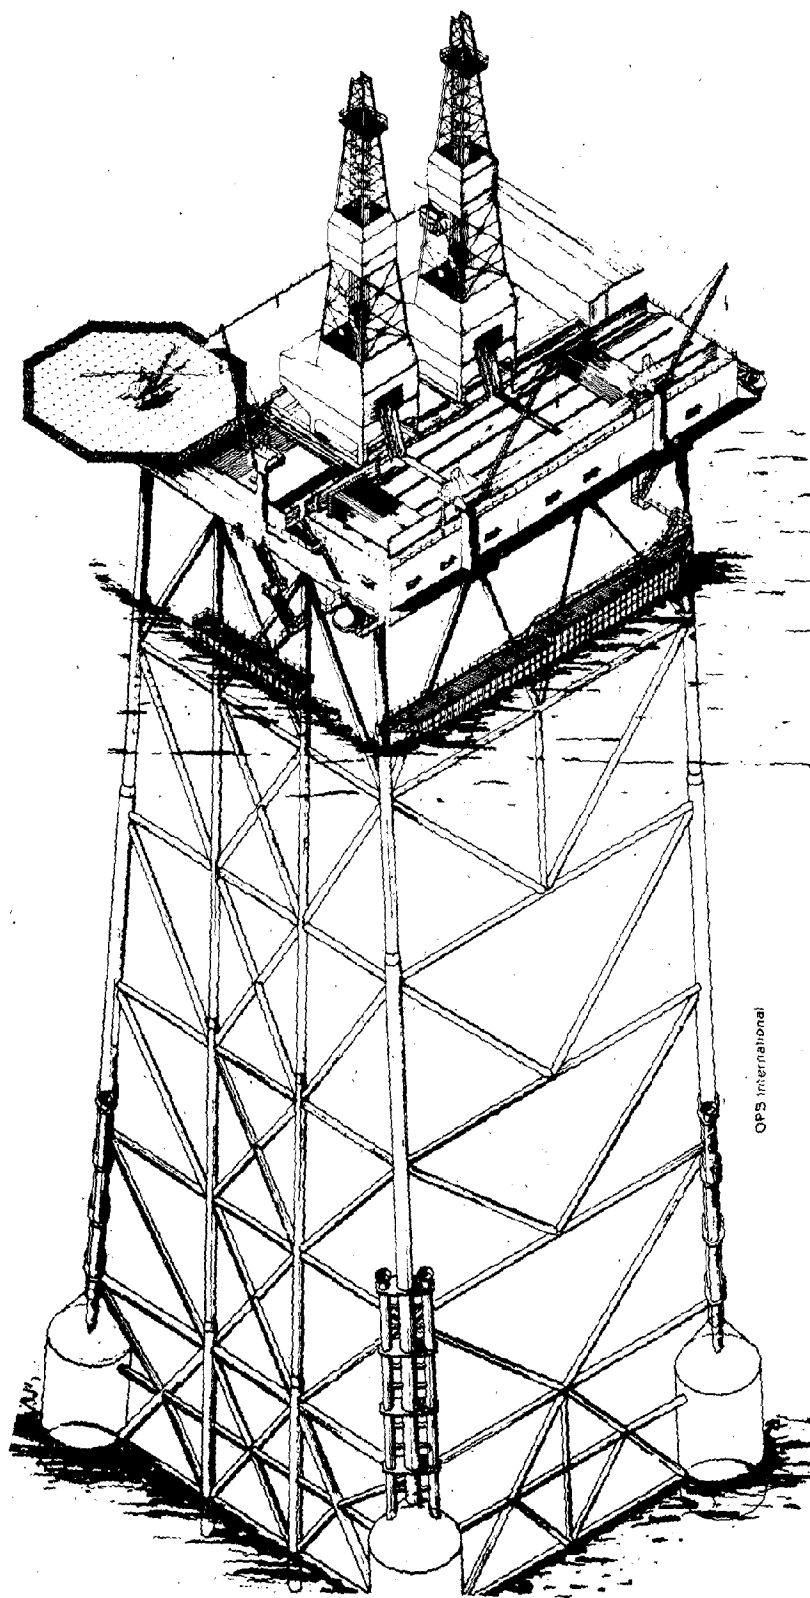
A Fixed Drilling Platform. (Courtesy Interconsult)
